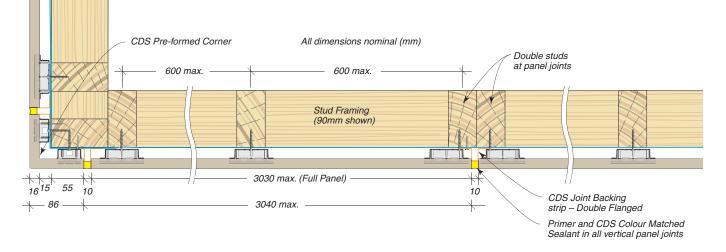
Typical Framing Set-Out with 70mm Timber Framing and CDS Pre-formed Corners - Plan View
